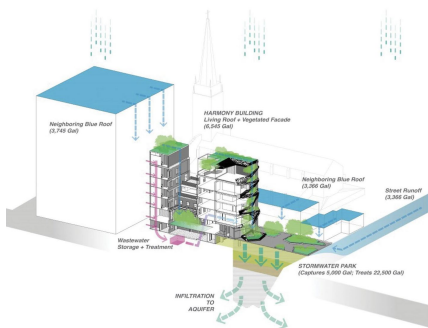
Source: Hyphae Design Laboratory Title: Harmony Building Water Section, Louisville, KY Online Digital Image 2016. Accessed June, 2019
